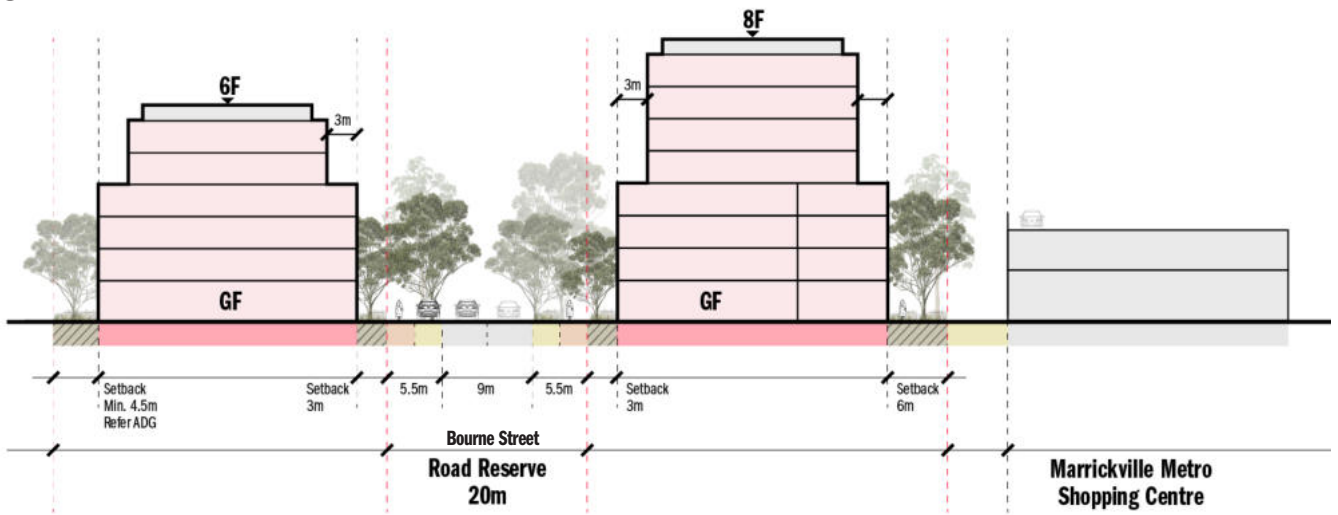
Section 1 - Section through Bourne Street towards Marrickville Metro
